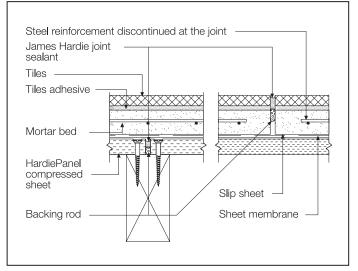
METHOD 1 - MOVEMENT JOINT DETAILS
